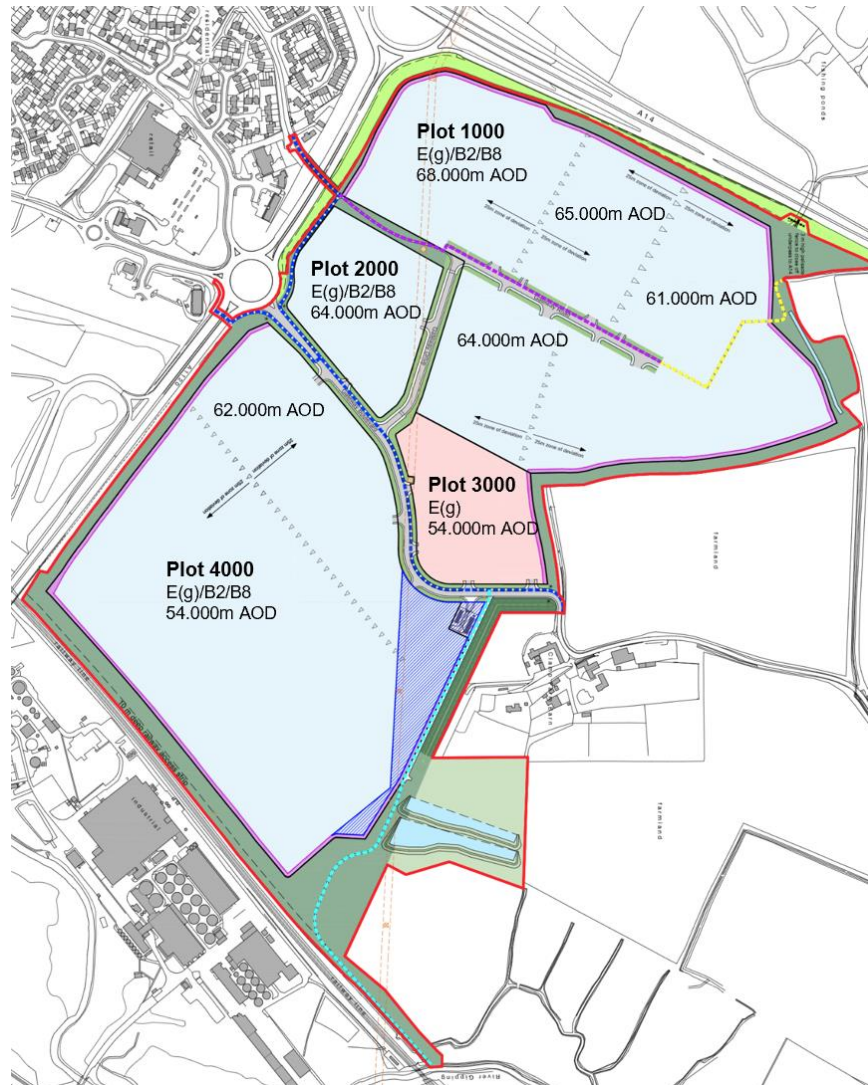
Parameters Plan submitted at outline stage (DC/21/00407)
